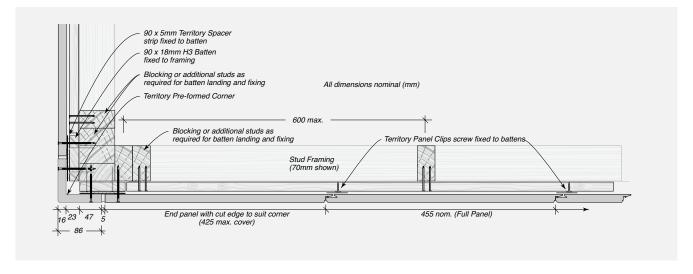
Typical Territory System Cross Section – Elevation
